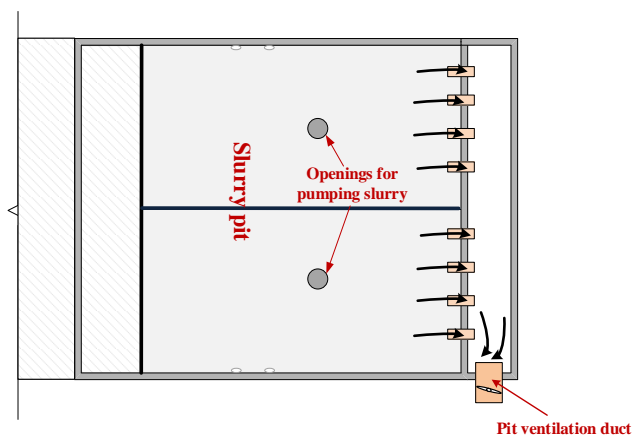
Floor plan of the pit ventilation underneath the floor in System W (both rooms had the same layout).
